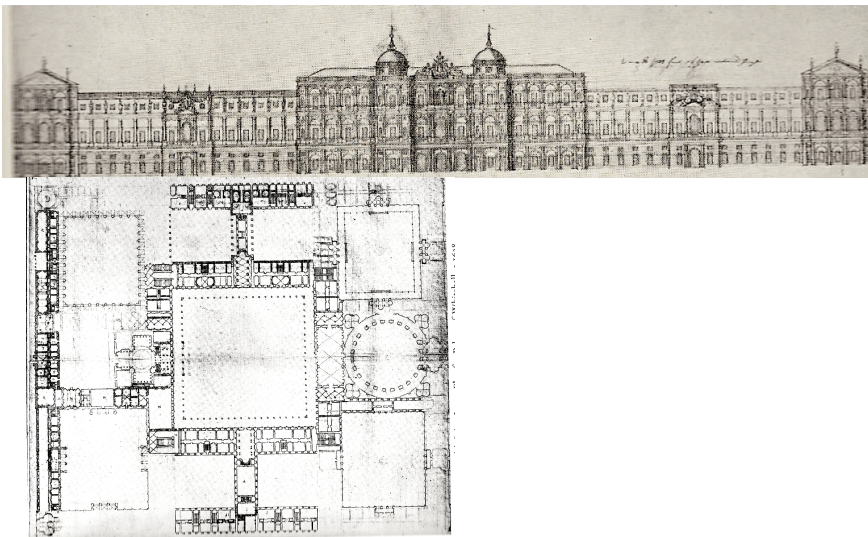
(above) Jones' Design for Whitehall Palace River Front Elevation (c. 1638). (below) Jones' Plan for Whitehall Palace (c.1638) (Images: Summerson, John. *Architecture in Britain, 1530-1830*. New Haven: Yale University Press, 1993)
